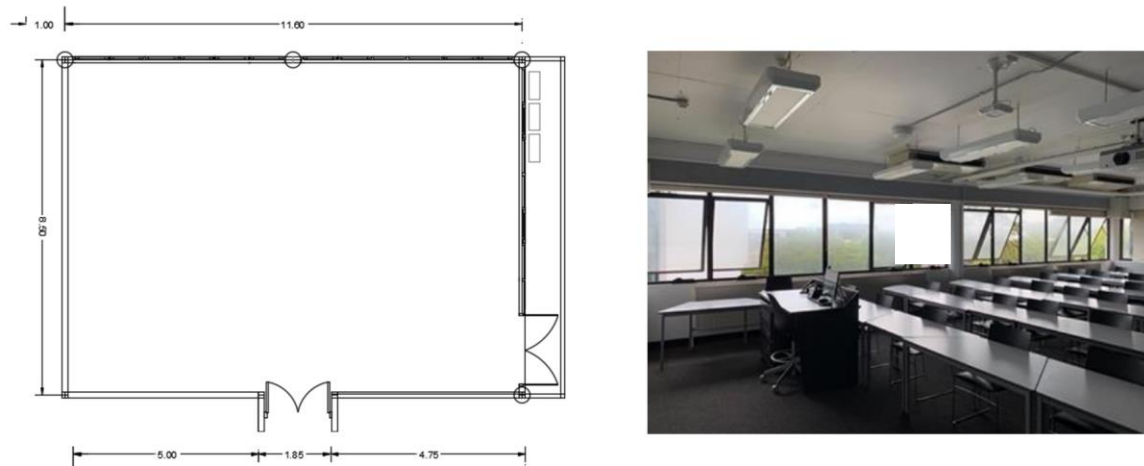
Floor plan and situation of room 481 of Wilkinson Building at the University of Sydney
